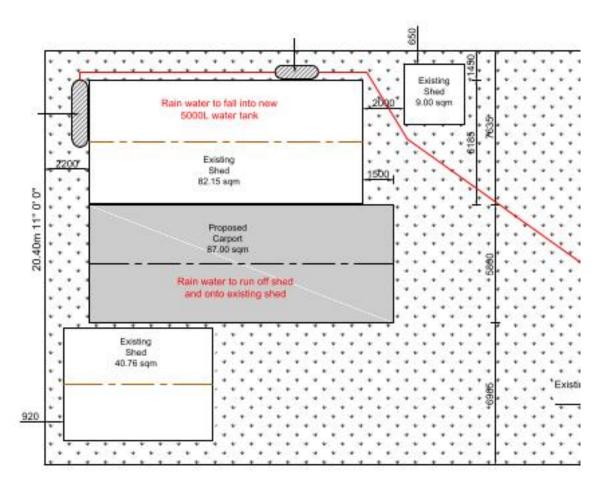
Part Site Plan: 13 Glyndwr Avenue, Oberon.
